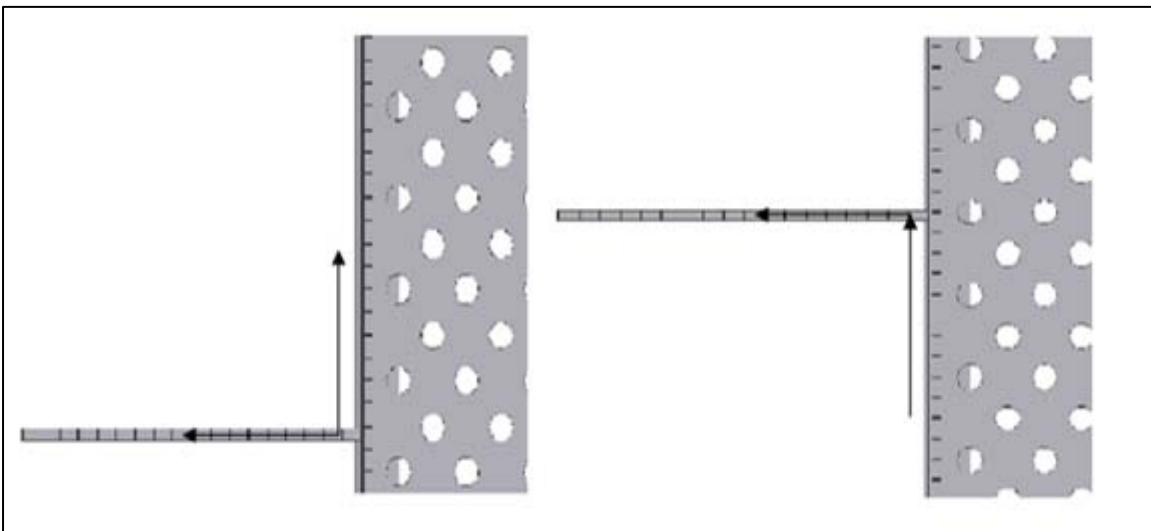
East wall anchors, (left) the platform section being deployed and (right) the deployed platform—Alternative A
